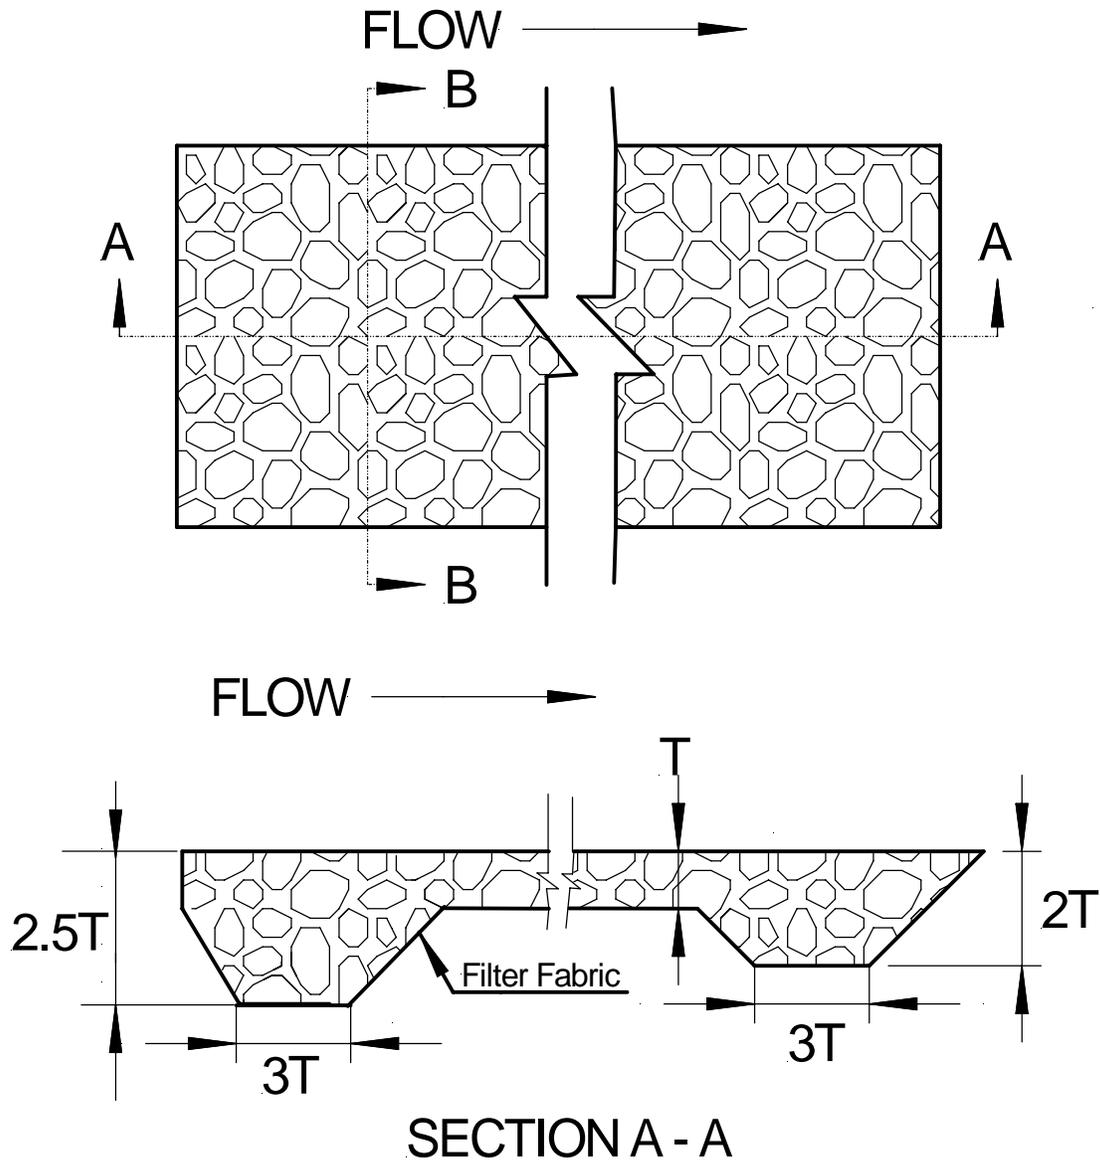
Typical Riprap Installation: Plan and Flank Details
